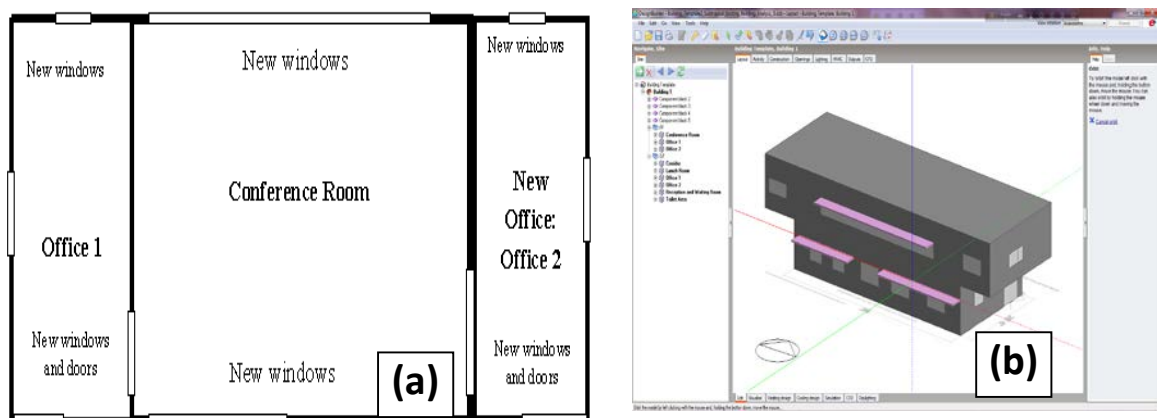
Typical Floor plan (a) and 3D model of the two storey Office building (b)
